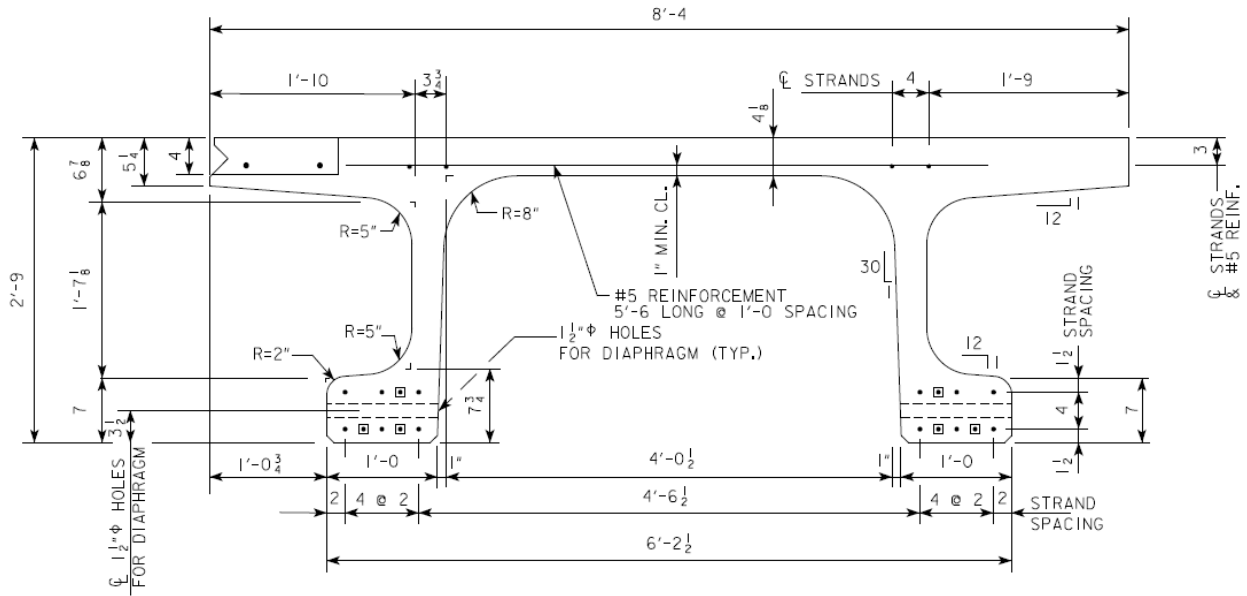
Second Generation UHPC Pi-Girder Cross Section
